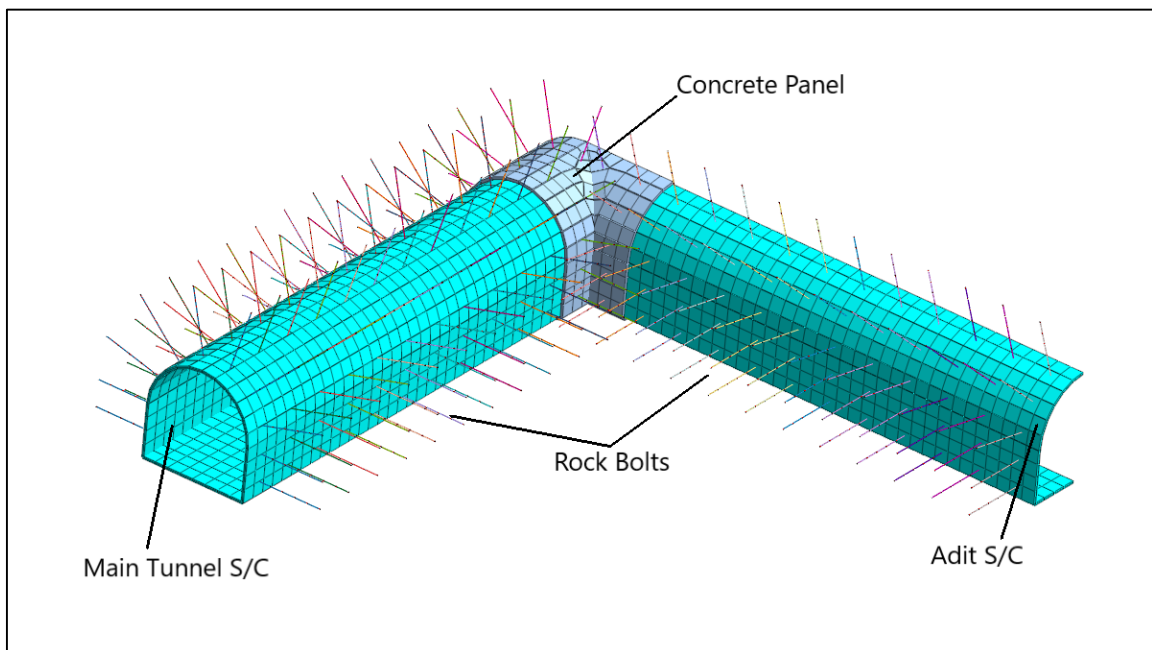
3D presence of Concrete panel, Shotcrete and Rock Bolt in adit connection
